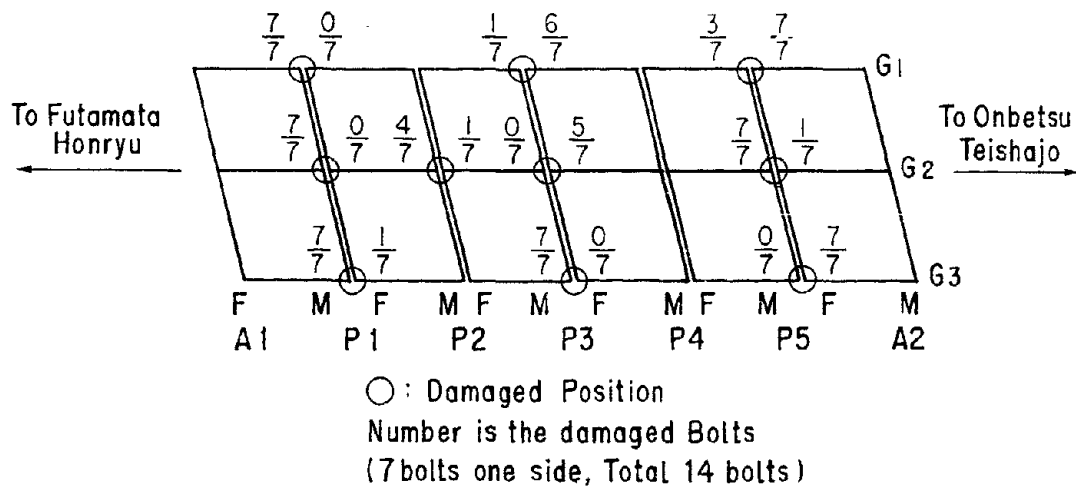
Location of damage to the connection devices between adjacent girders (Hatsune Bridge)
